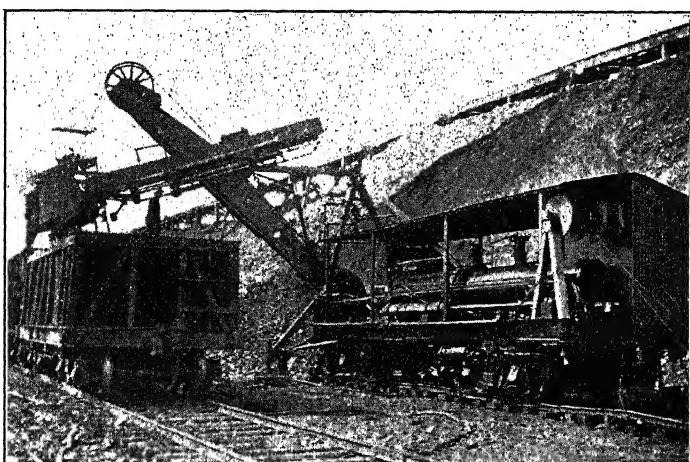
ELECTRO-HYDRAULIC SHOVEL WITH COMPRESSED-AIR TANKS REMOVED.
